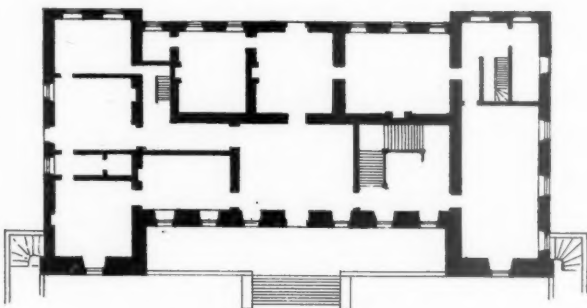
PLAN OF GROUND FLOOR, 1717.
